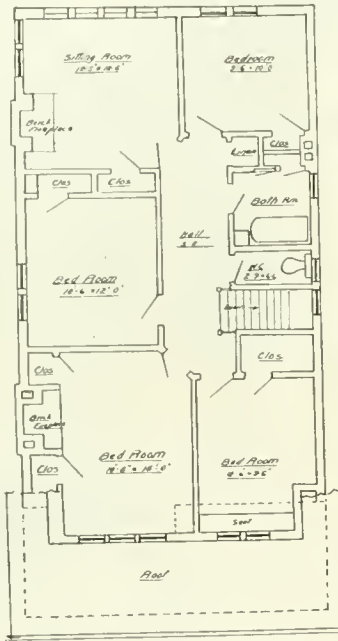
Bedroom floor of house shown in Fig. 6.
